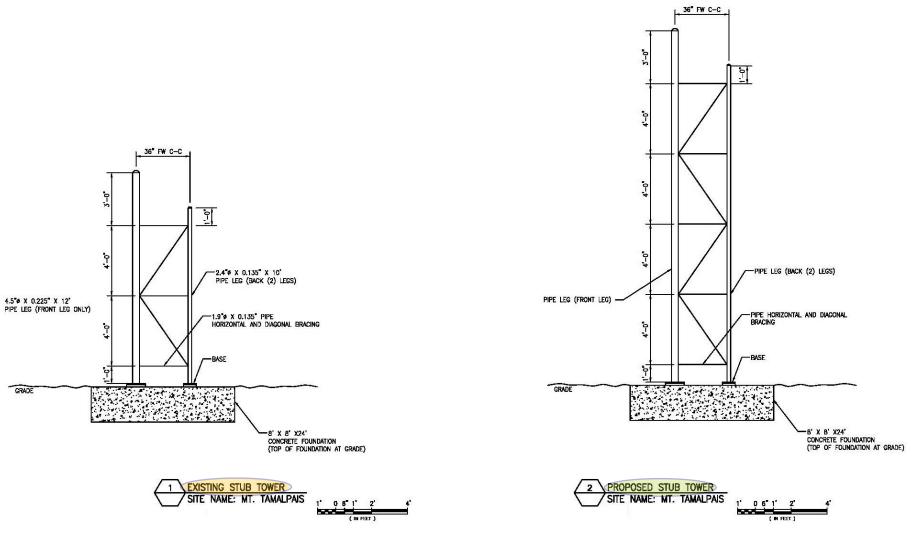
Site 4 - Mt. Tamalpais Existing and Proposed Stub Tower Elevations
